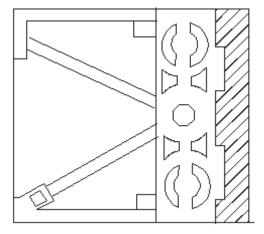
1995-2016 - Reconstructed Pye Layout
